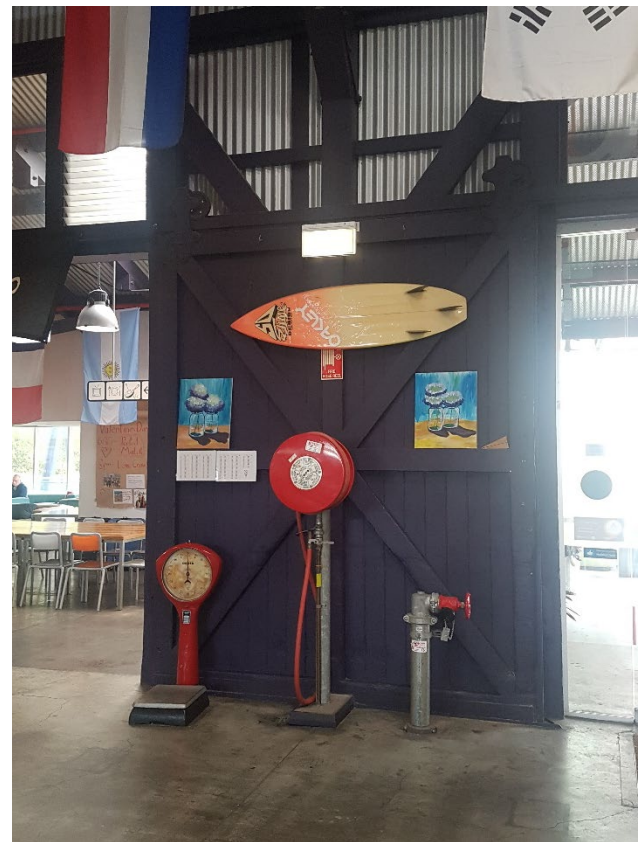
Detail of original timber sliding door in reception area, ground floor
